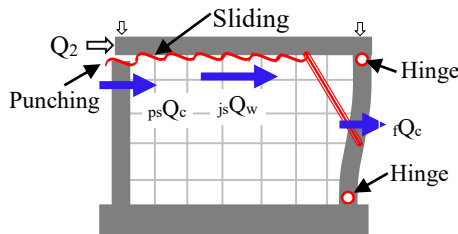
Load transfer mechanism of column punching and joint failure (Failure II)
